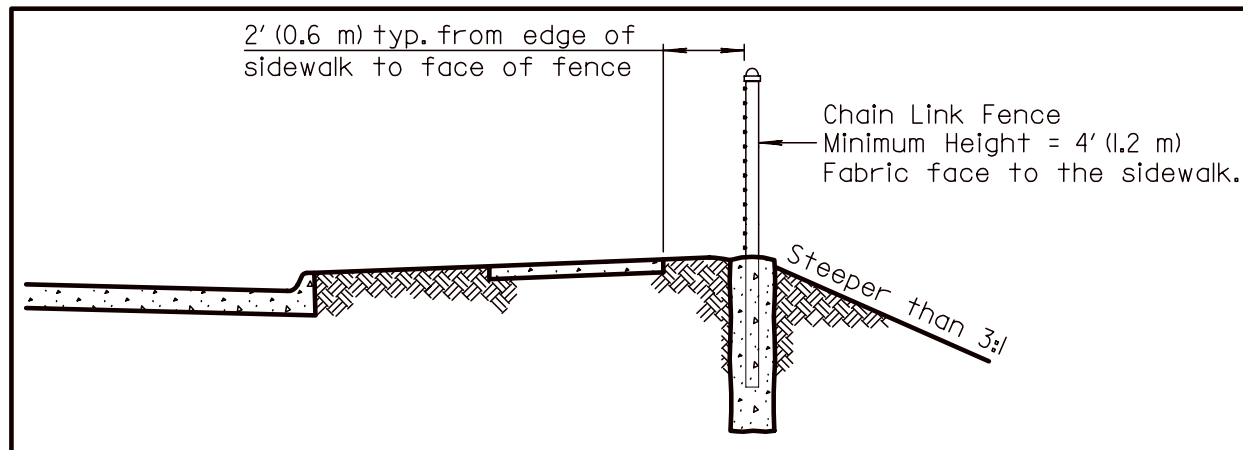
Fencing on Steep Slopes Adjacent to a Sidewalk
